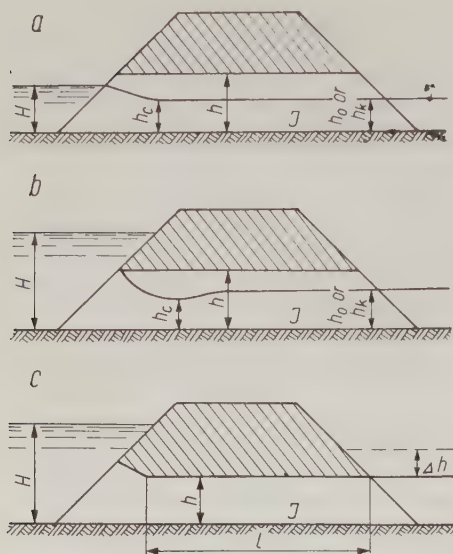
Scheme of water discharge in a culvert: *a* — pressureless culvert, *b* — pressure culvert working with a part of the cross section, *c* — pressure culvert working with full cross section
